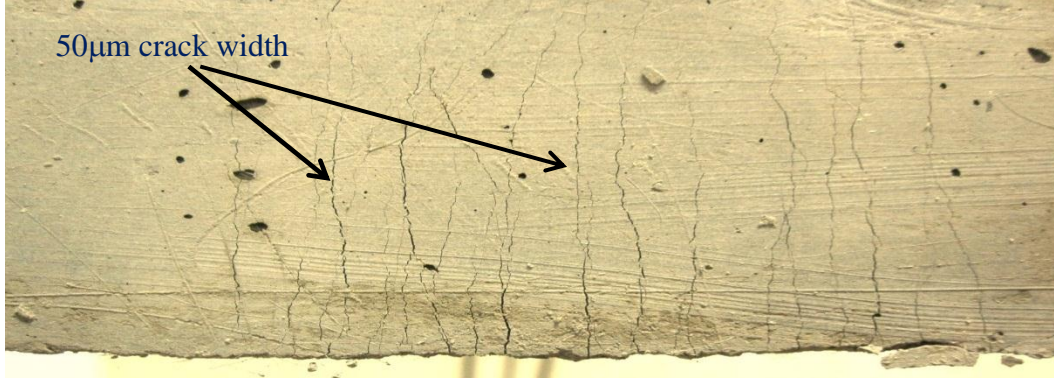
Typical side way cracking patterns of ECC beam specimen after flexure loading (Mix ID.: F_2.2_CS)
